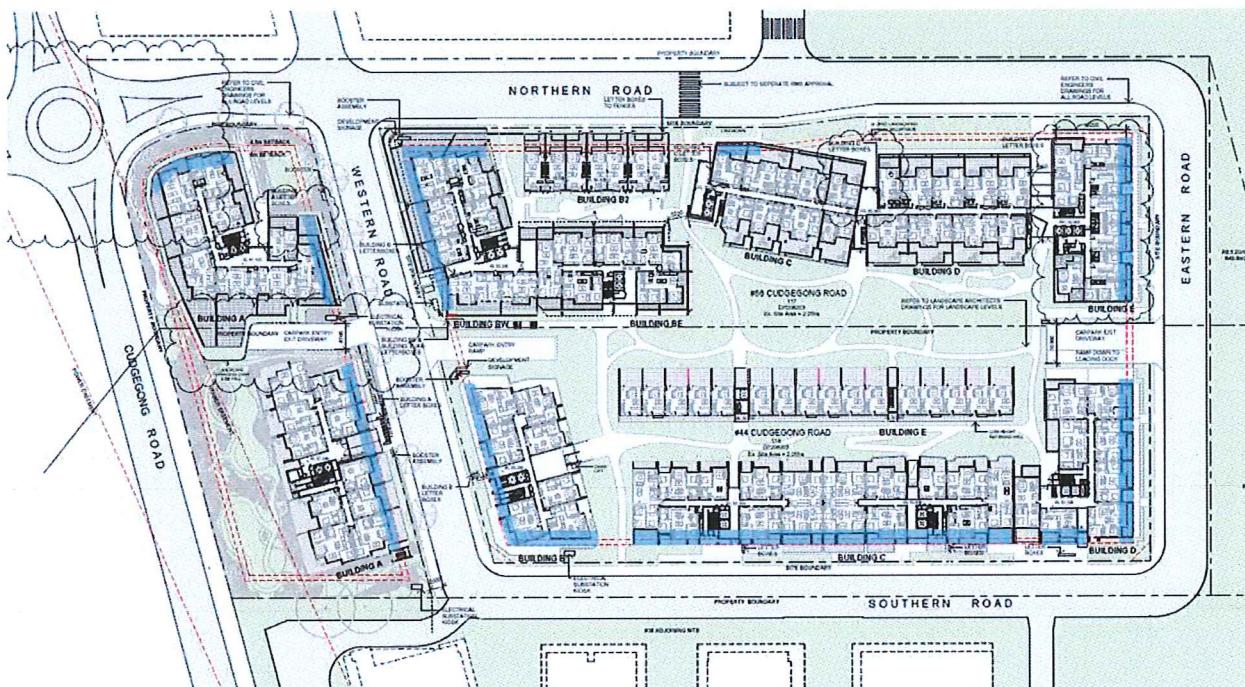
Extract from the proposed Site Plan DA004 demonstrating the portions of the private balconies and architectural design features which encroach into the 6 metre street setback requirement above the third level. These areas are highlighted in blue.
